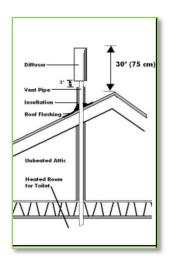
Schematic showing the vent stack installation through the roof. Image courtesy of Sun-Mar.
